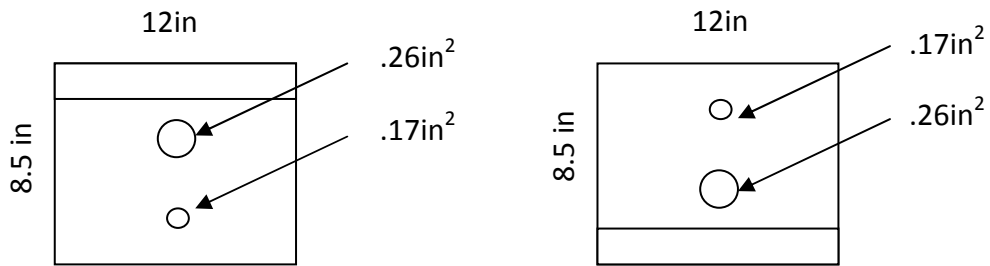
EQUIVALENT SECTION OF CONCRETE SLAB
